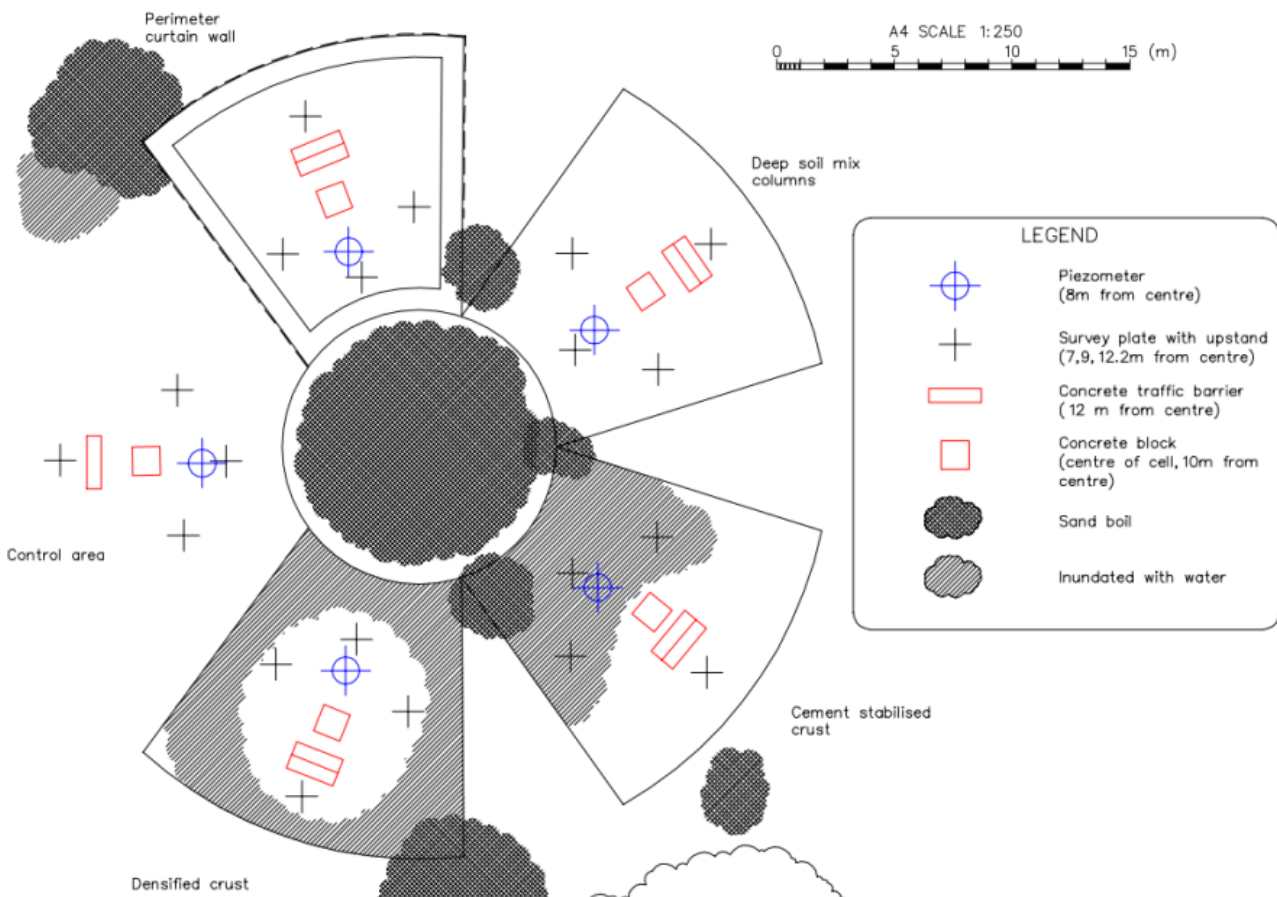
Ground improvement trial layout, showing extent of ground improvement zones, instrumentation layout and observations following the trial.
